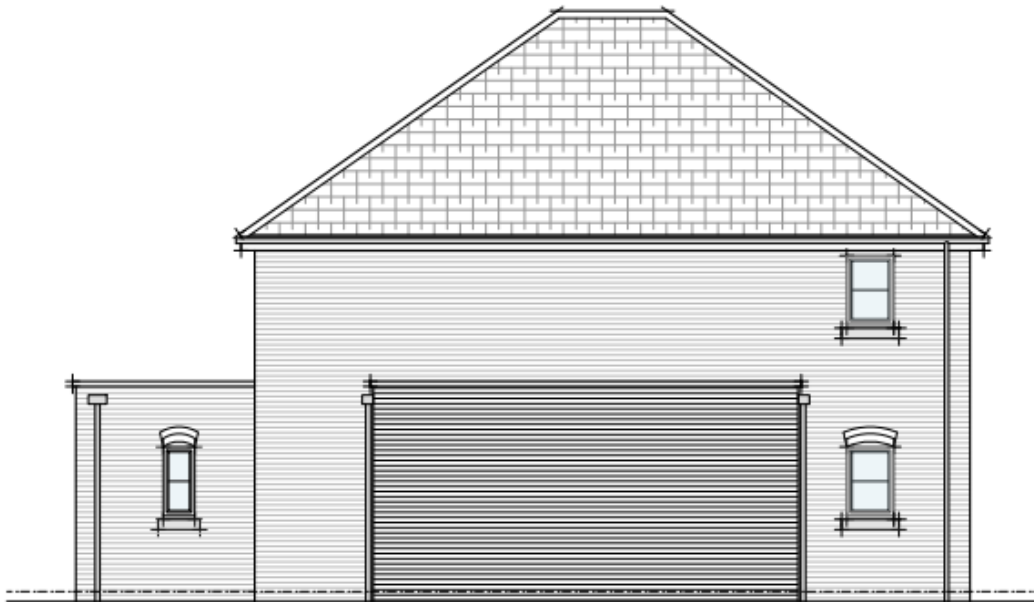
This elevation will face the rear of 10 Birkinstyle Lane, views towards the first floor windows at no.10 are screened by the forward projection.
